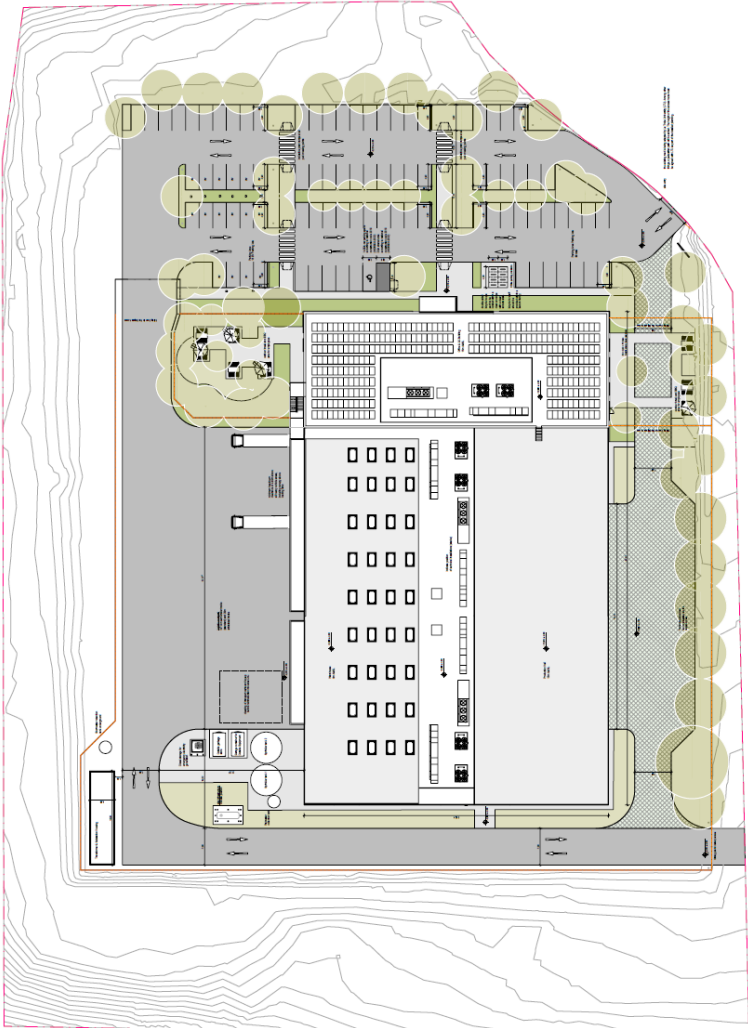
Site Plan Source: Applicant documentation - Architectural Plans
